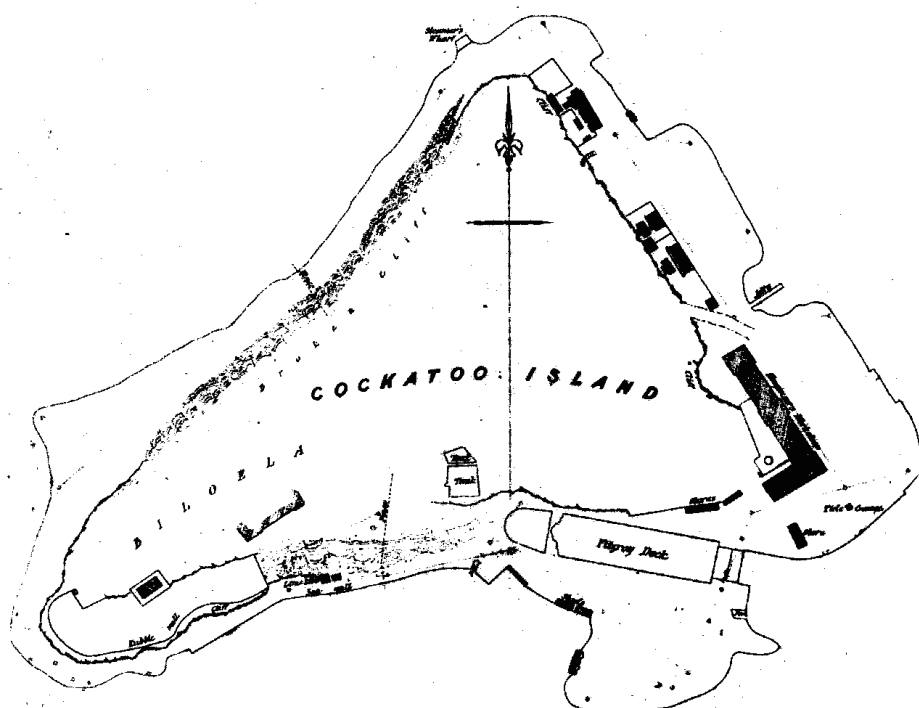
Plan of Cockatoo Island c1870 showing the Fitzroy Dock as completed and with outline of the first extension. The Engineering Workshops have been completed to their full size (Source: Jeremy, op cit. p8)
